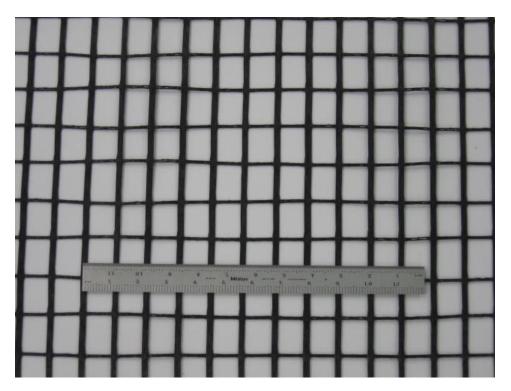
Photo of Miragrid 5XT (machine direction is perpendicular to ruler shown).
